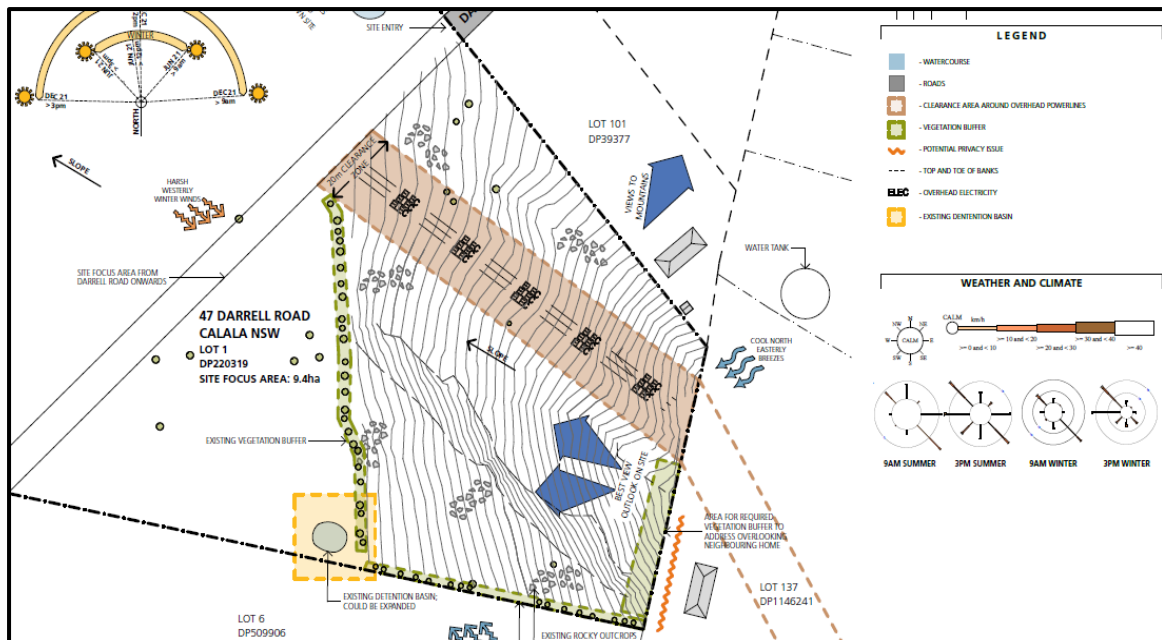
Lot layout showing transmission easement and proposed vegetation buffer (source: SCC application report – Perception Planning)
